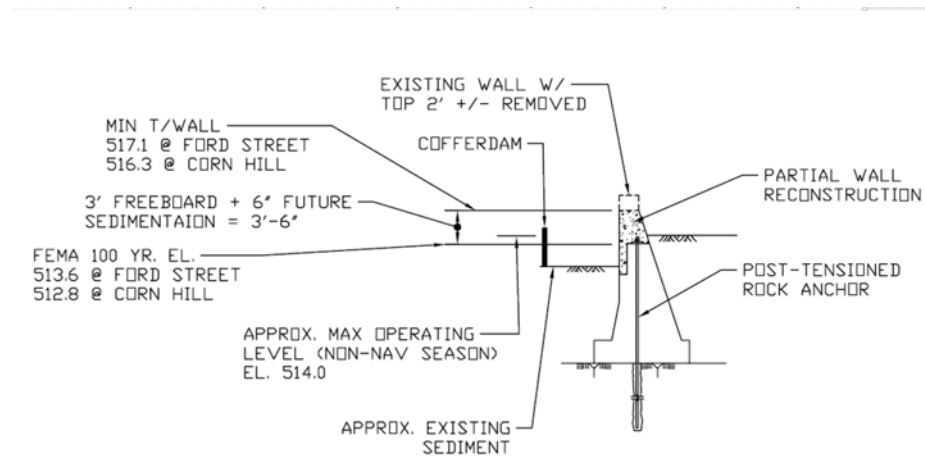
ALTERNATIVE 2 CROSS-SECTION
